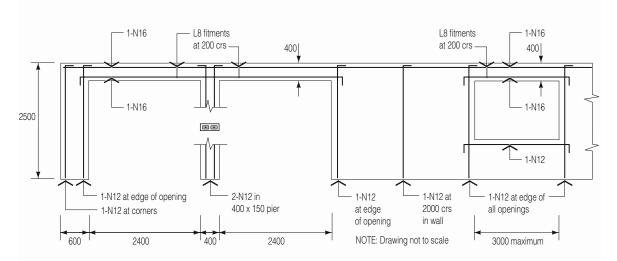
Wall Reinforcement for 140-mm Leaf for Wind Classifications N1, N2 and N3 and 2500-mm Wall Height
